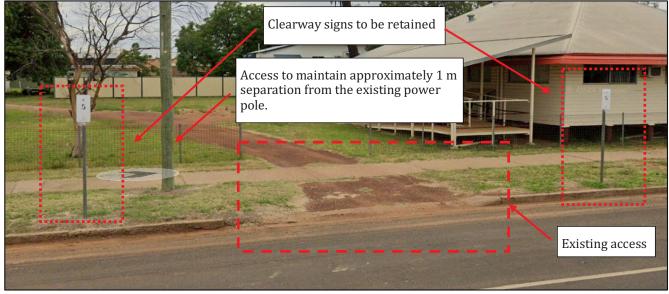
Sturt Street crossover location [Source: Google Street View]
